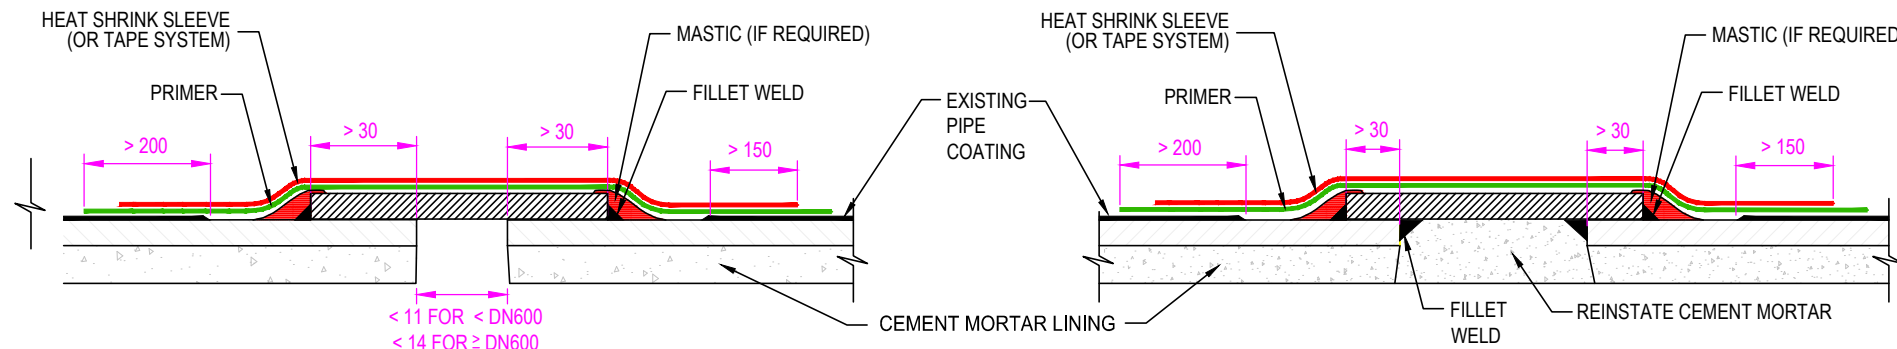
A: SPHERICAL SLIP-IN WELDED JOINT (SSJ)
